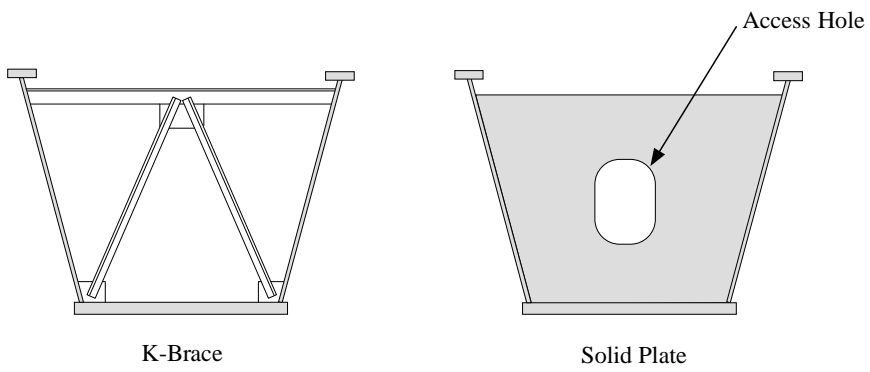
Interior U-Girder Diaphragms and Stiffeners
